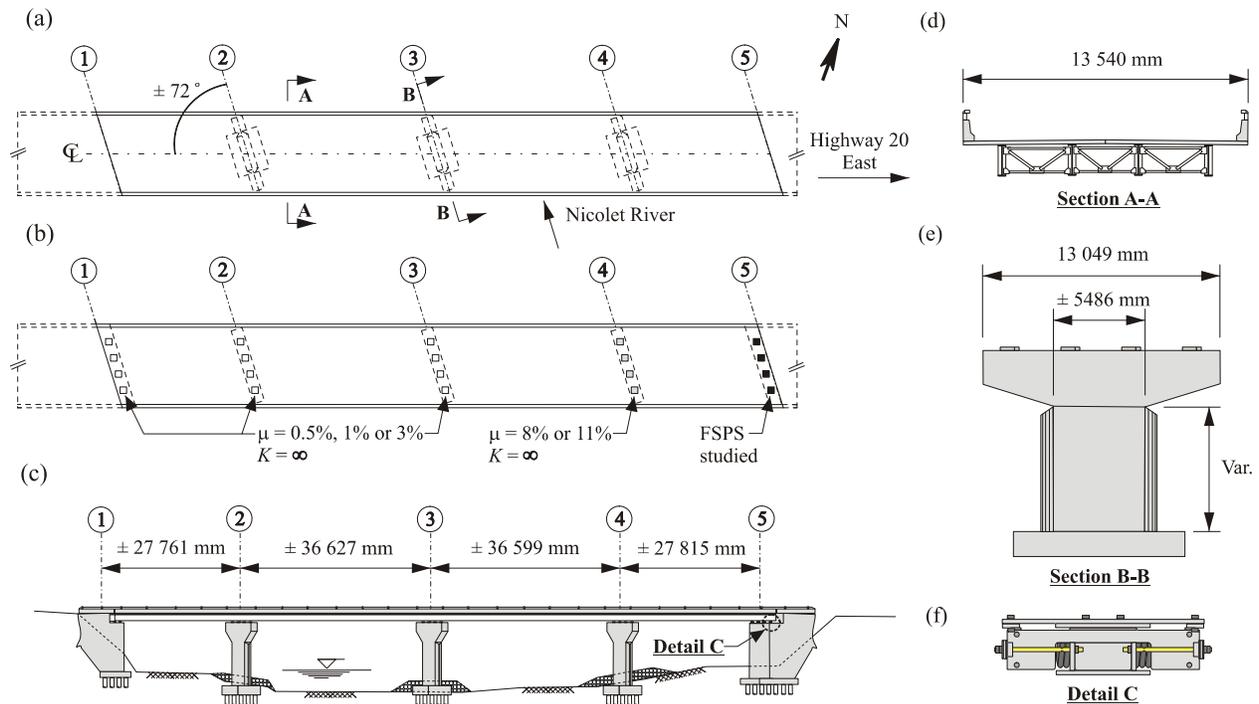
Bridge with FSPSs: (a) Plan view; (b) Bearing properties; (c) Elevation; (d) Deck; (e) Pier; (f) FSPS.
